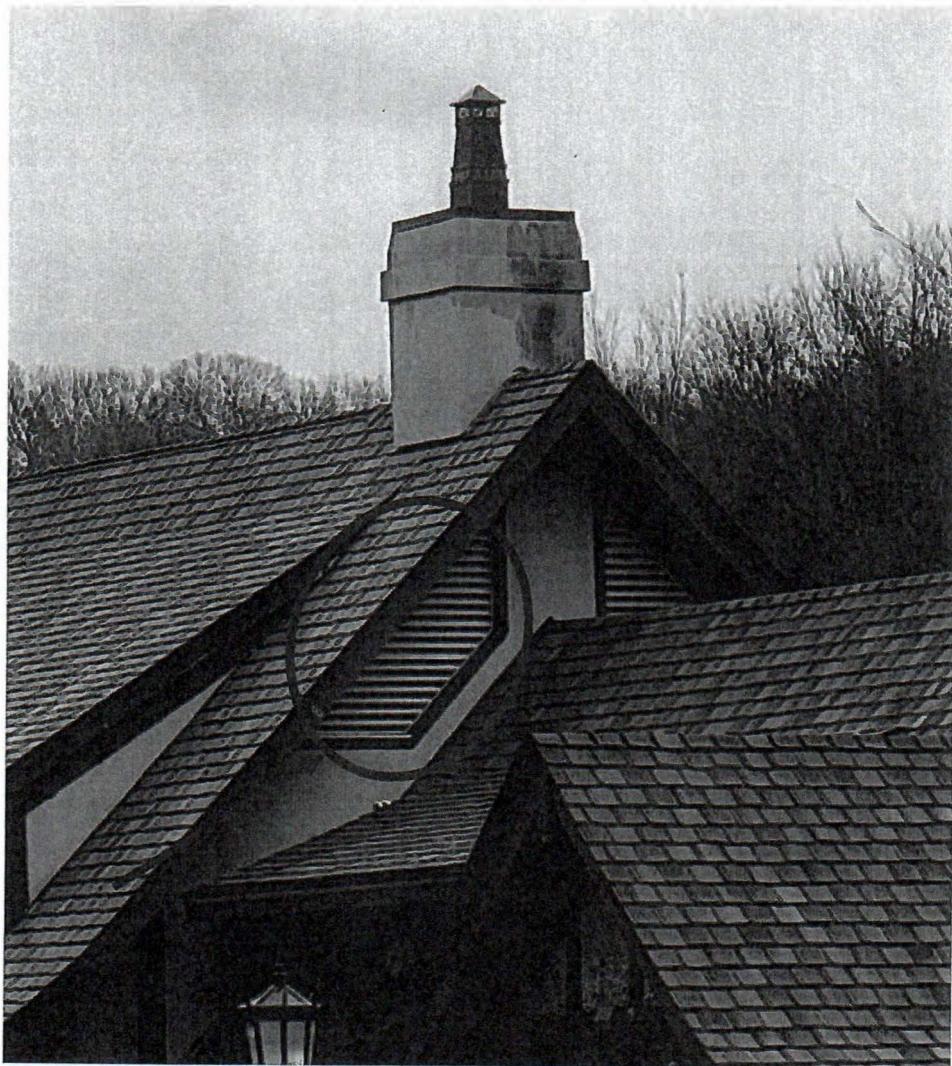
Louvers Providing Outside Air to Air Handlers in Attic
